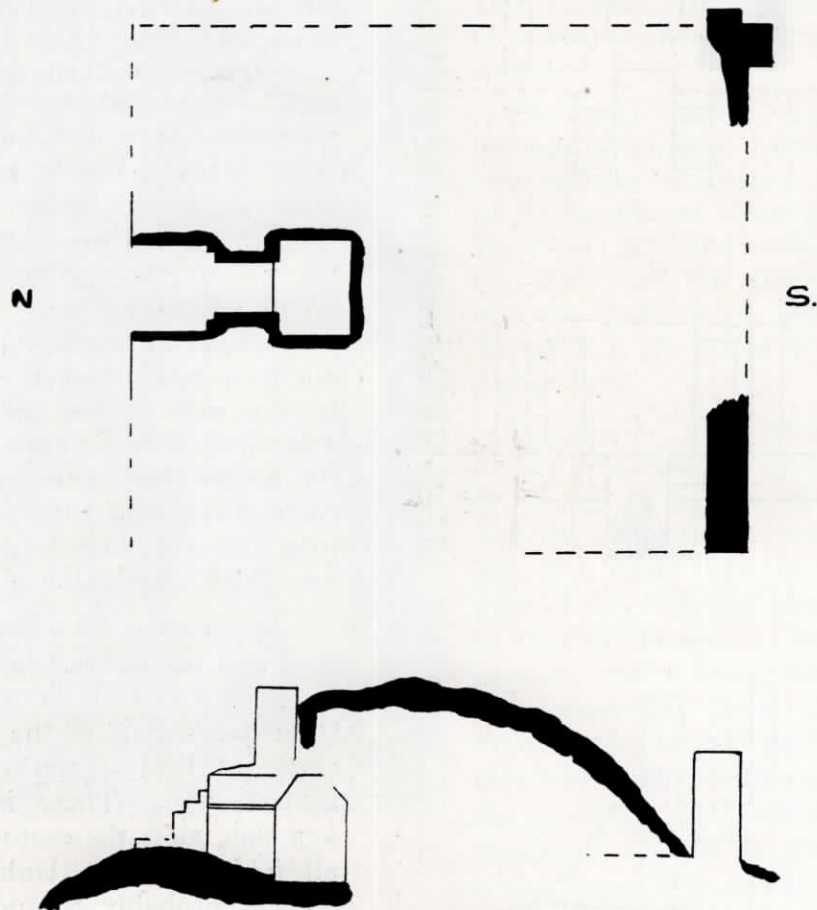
Comalcalco, Tab. Ground plan and section of Temple 2.
